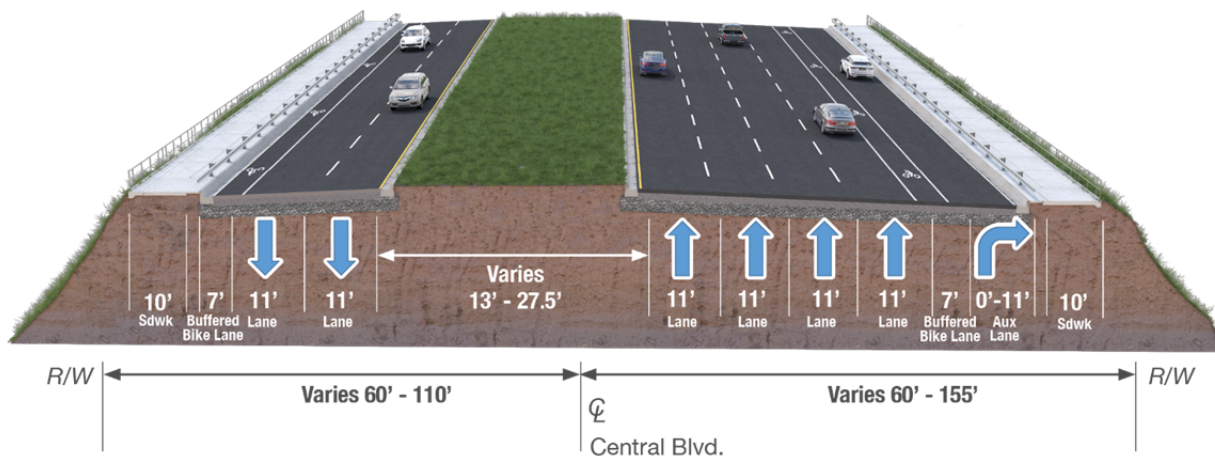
Proposed Typical Section - Central Blvd. West of I-95 – TDUI
